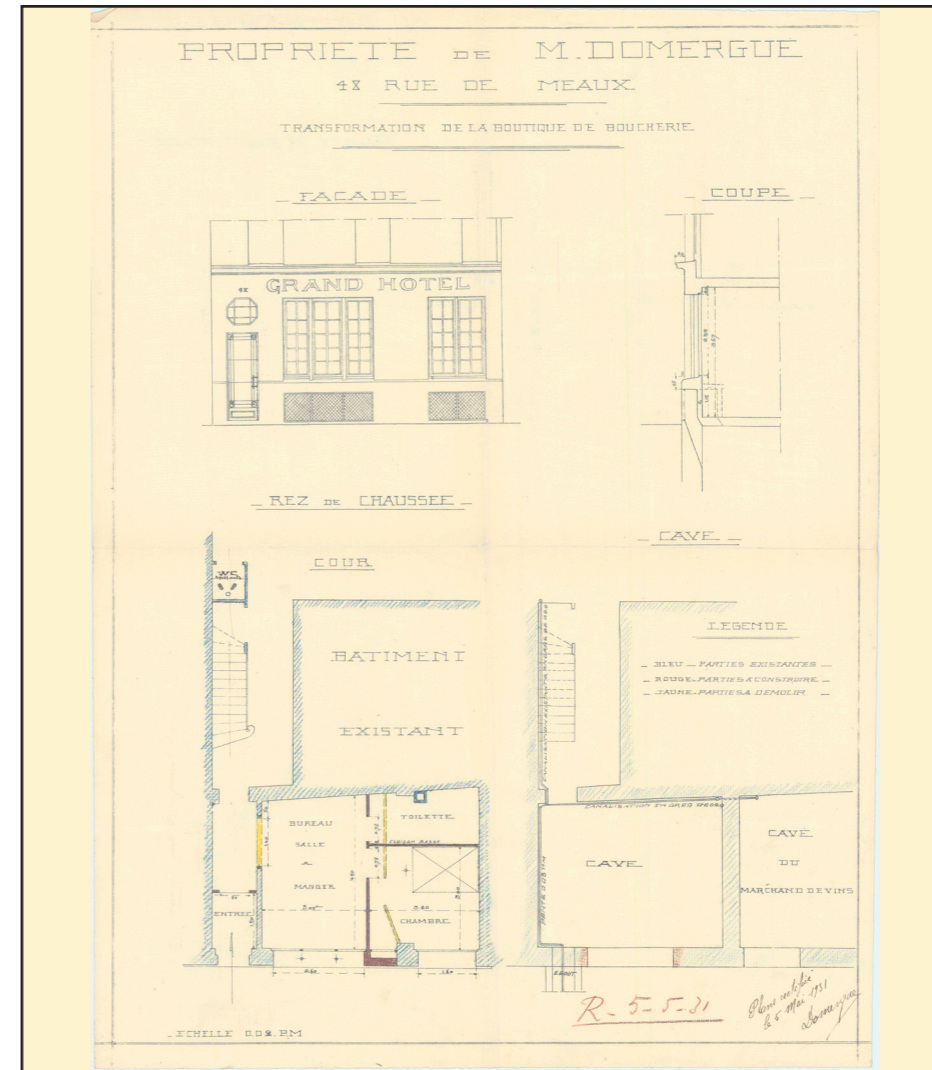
North-west facade, detail section and plan drawing of the ground floor and cellar shows the 1931 changes.
